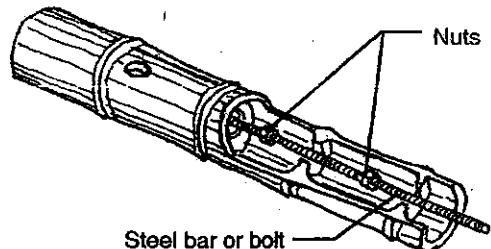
CROSS SECTION AND CONSTRUCTION DETAILS
